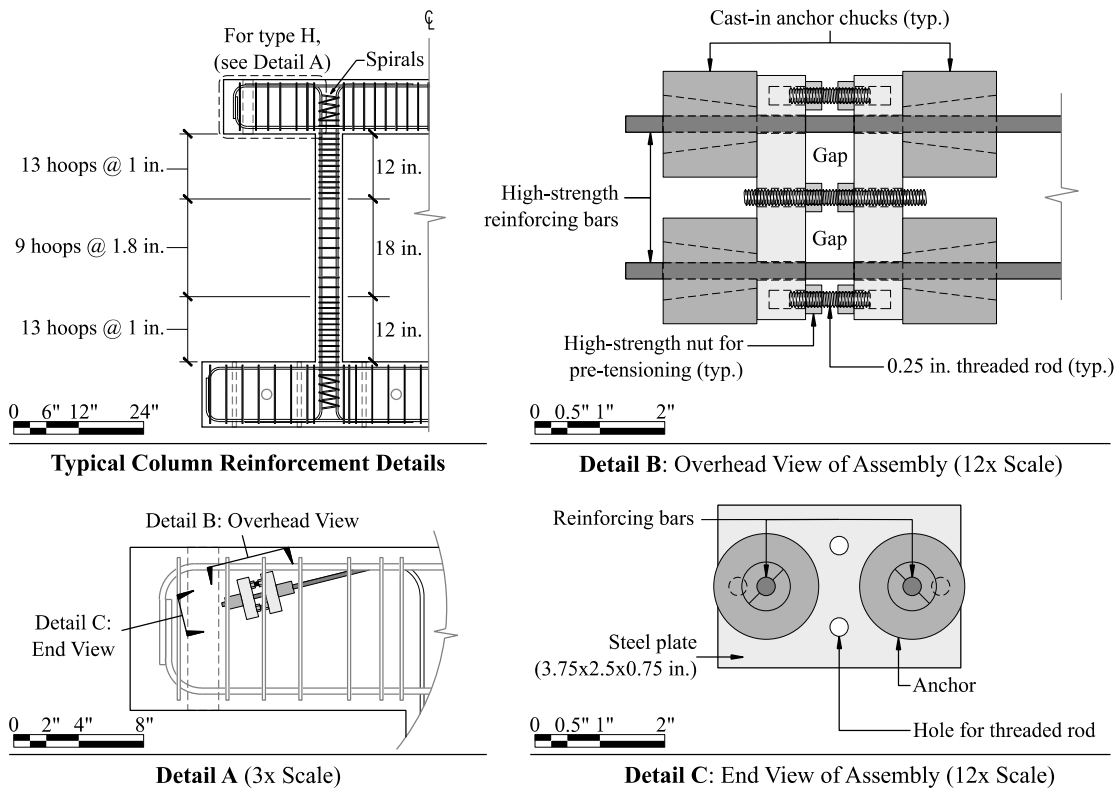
Column reinforcement plans showing anchorage assemblies in type H columns.
